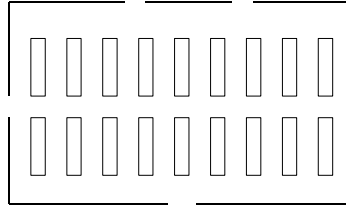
Schematic drawing of the shopping mall representing the assembly building.
